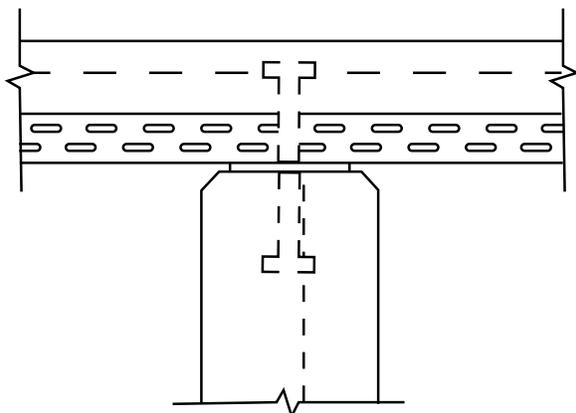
CONCRETE OR CMU WALL WITH EMBED PERPENDICULAR
